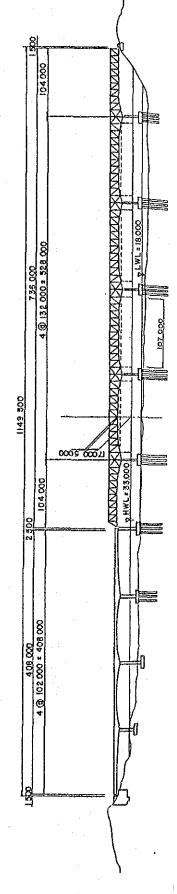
PROFILE OF TRUSS + P.C. BRIDGE
